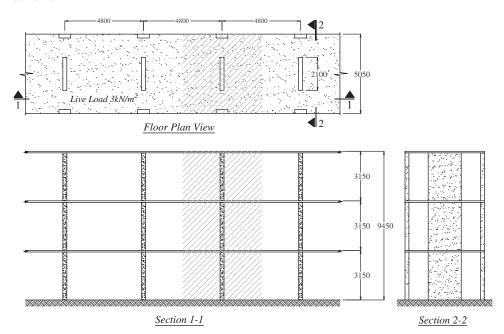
Prototype building showing typical slice (hatched) section to be modeled.
